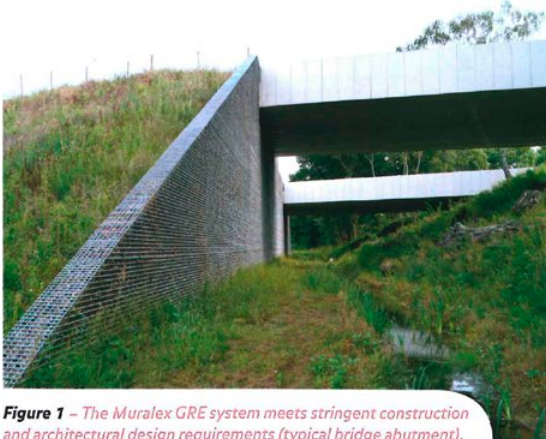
The Muralex GRE system meets stringent construction and architectural design requirements (typical bridge abutment).
